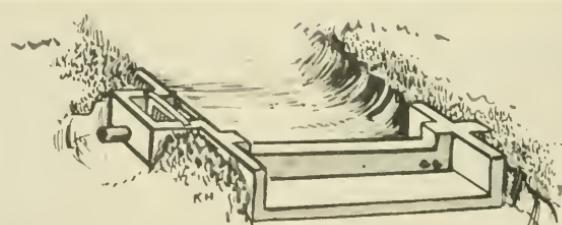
A low dam with outlet for supplying water to ponds.
